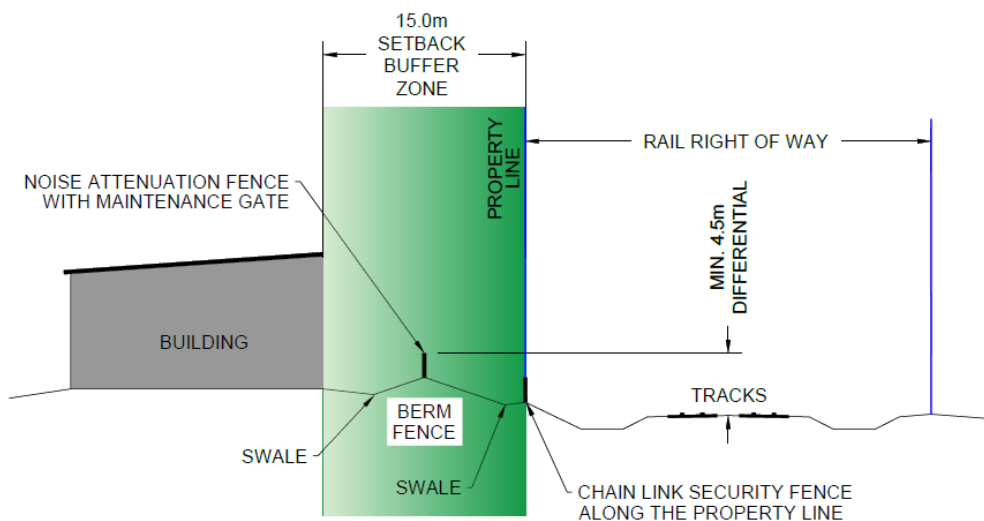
Commercial Building Setback / Buffering Adjacent to Railway
